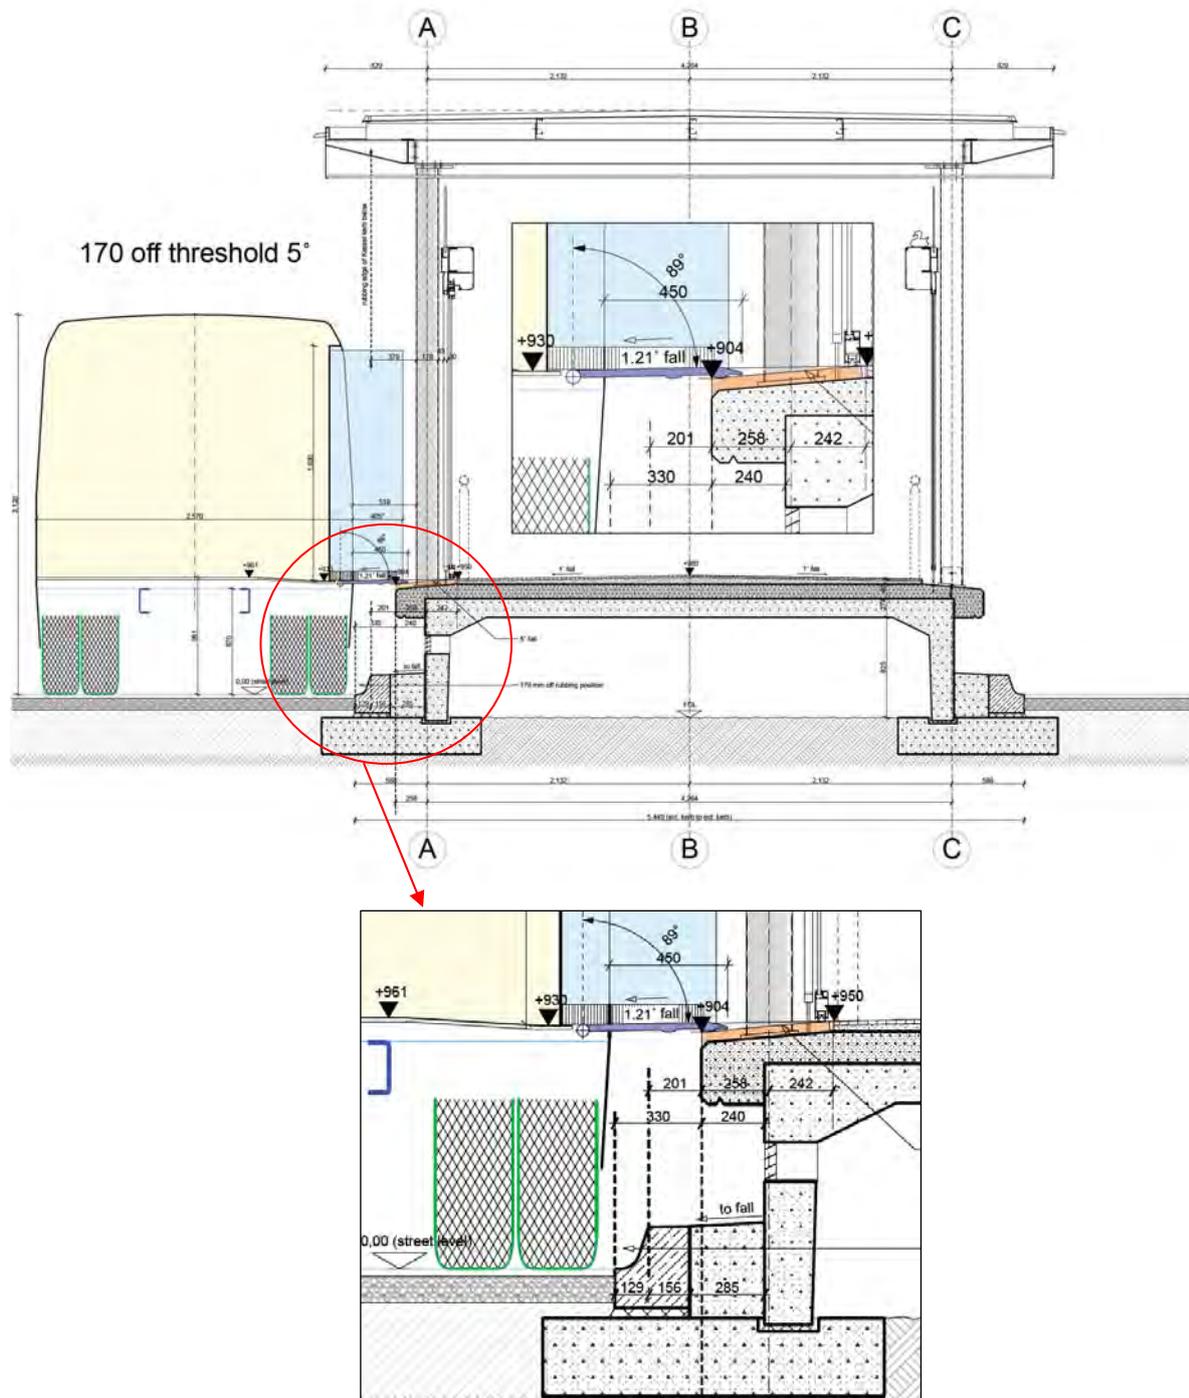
Drawing showing high floor trunk vehicles and stations, Kassel kerb and bridge
